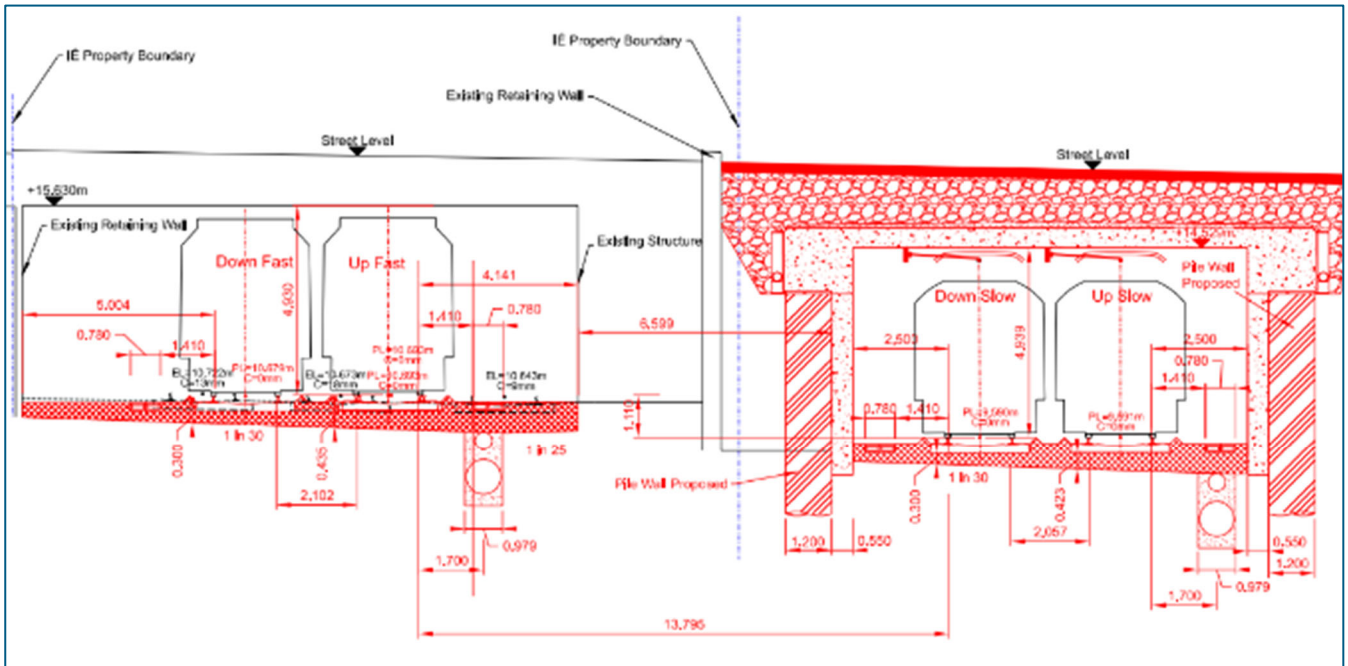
South Circular Road Bridge (OBC1) and New Cut and Cover Structure (OBC1A) – Cross section at Ch 9+401, View Facing West
